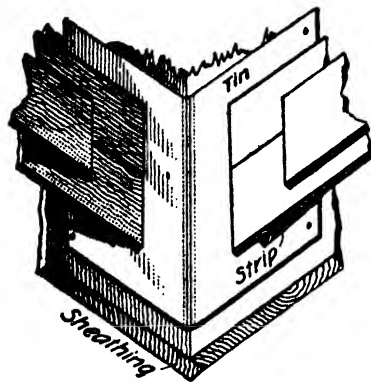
Wood Strips on Valley to Raise Shingles and Prevent Tin from Rusting
